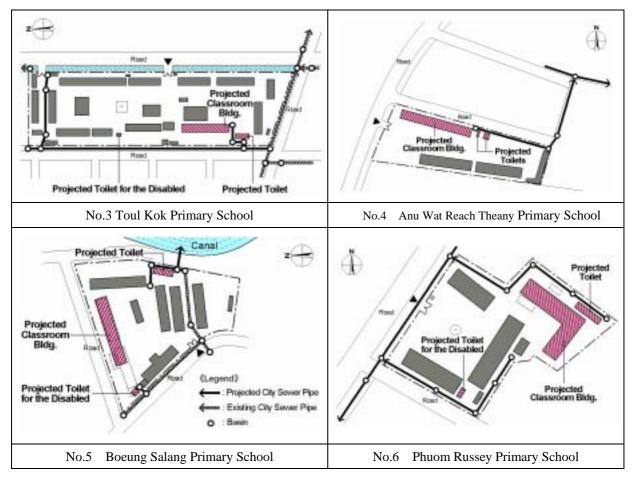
Plan for Construction of Drainage Pipeline by Phnom Penh Municipality
